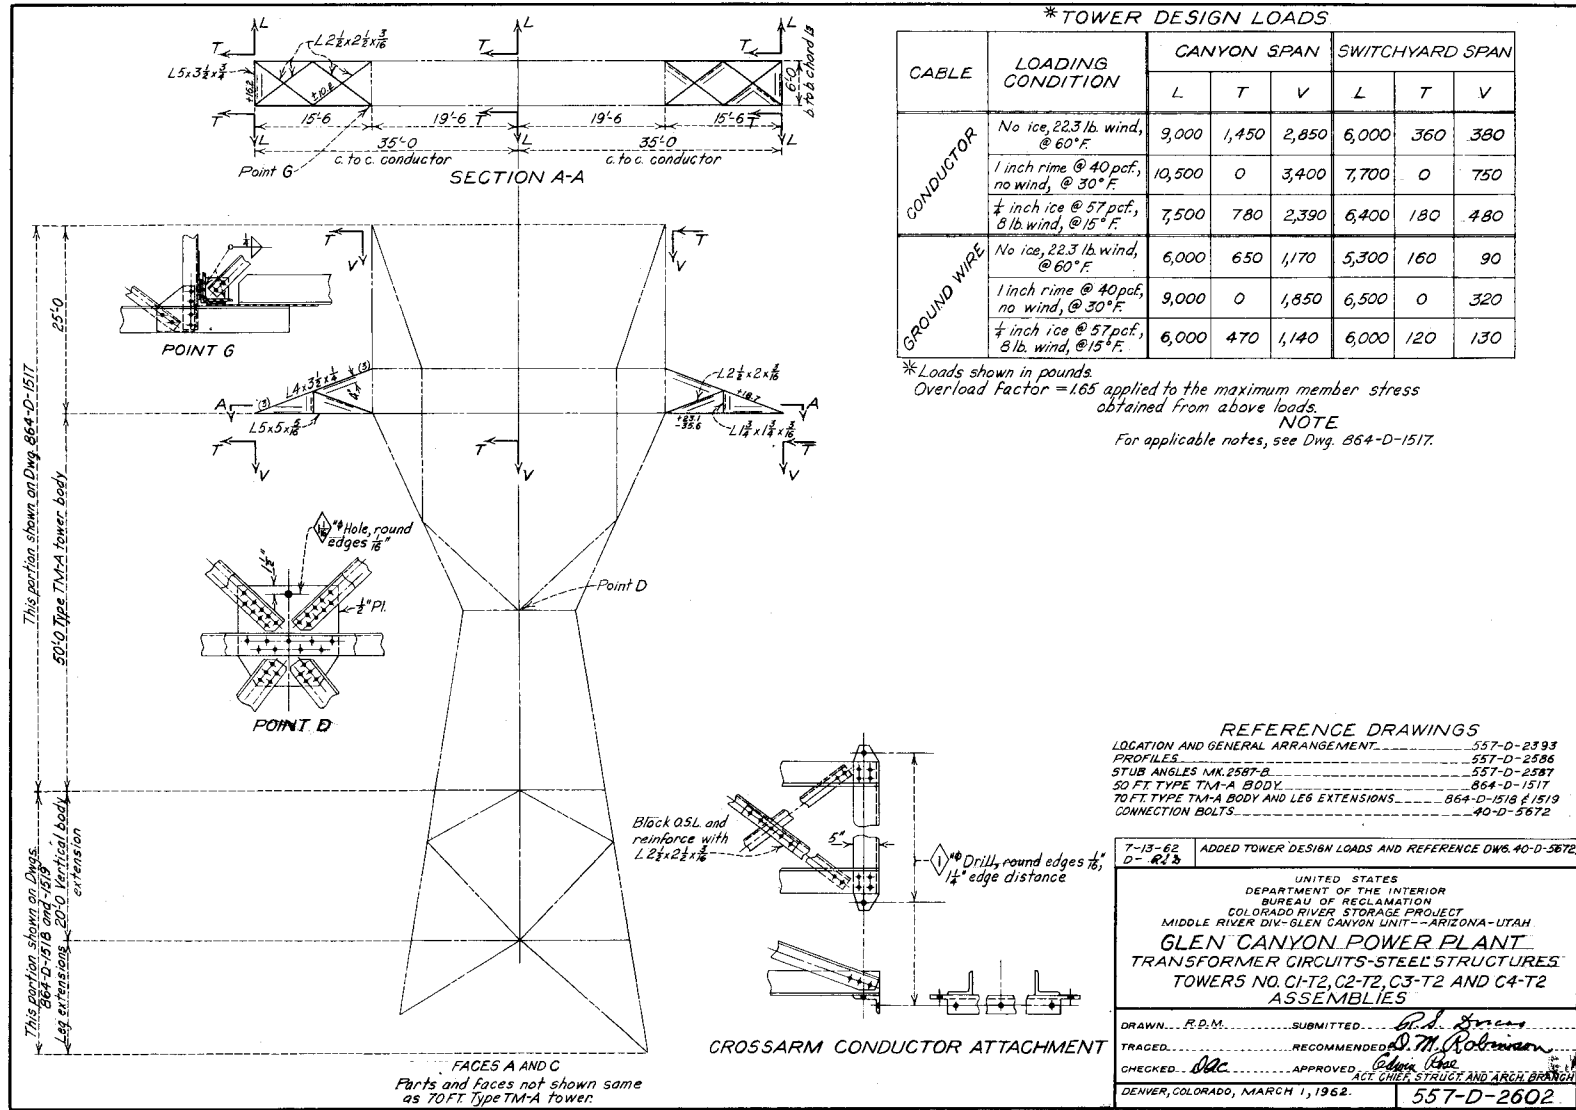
Transformer circuits steel structures—Assemblies of towers C1-T2, C2-T2, C3-T2, and C4-T2.
